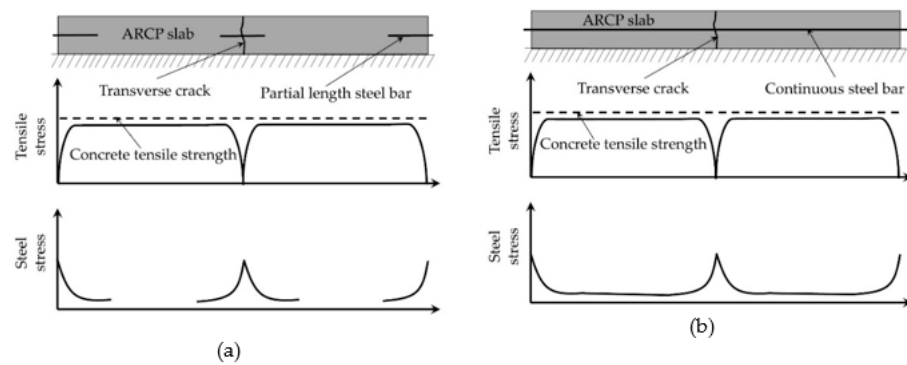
Cracking development in advanced reinforced concrete pavement (ARCP) with (a) partial length steel bars and (b) continuous steel bar.
